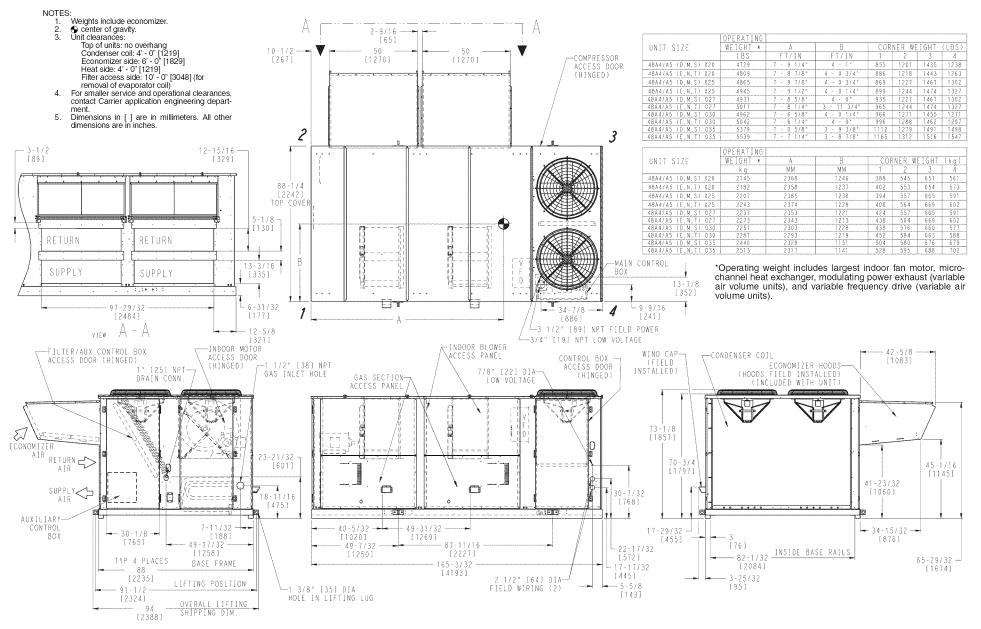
Base Unit Dimensions — 48A4,A5020-035
